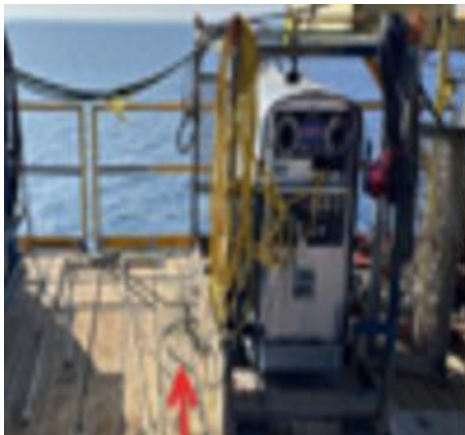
Welding lead contacted a wood plank on the deck, causing charring.
